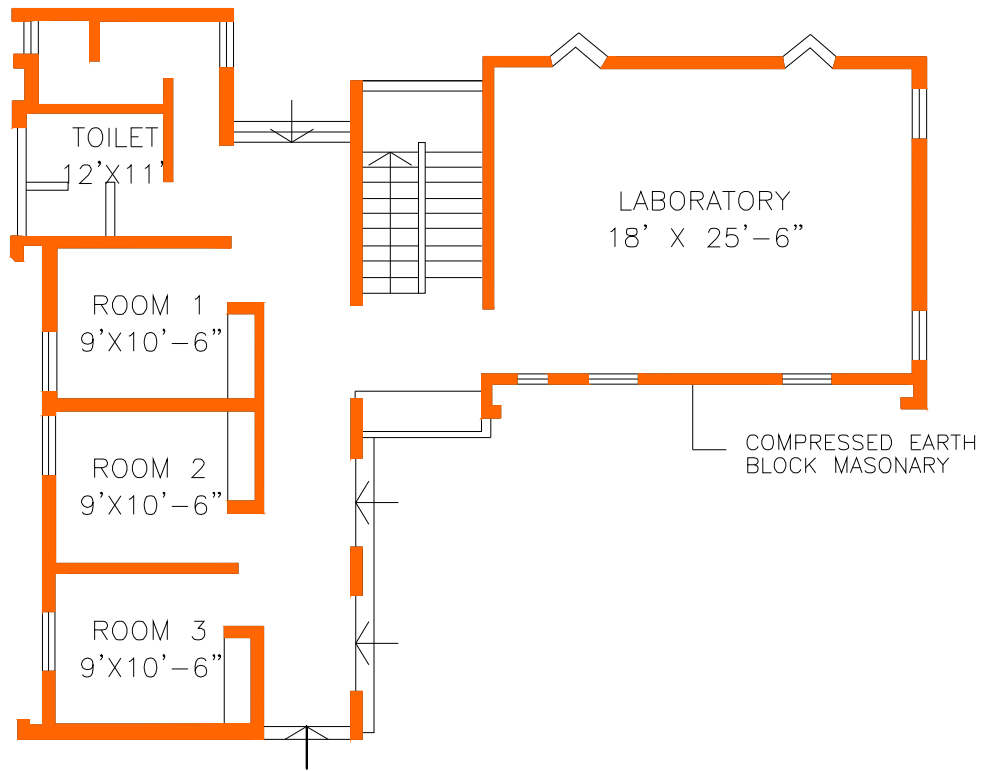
Ground floor plan of ASTRA building, Bangalore
